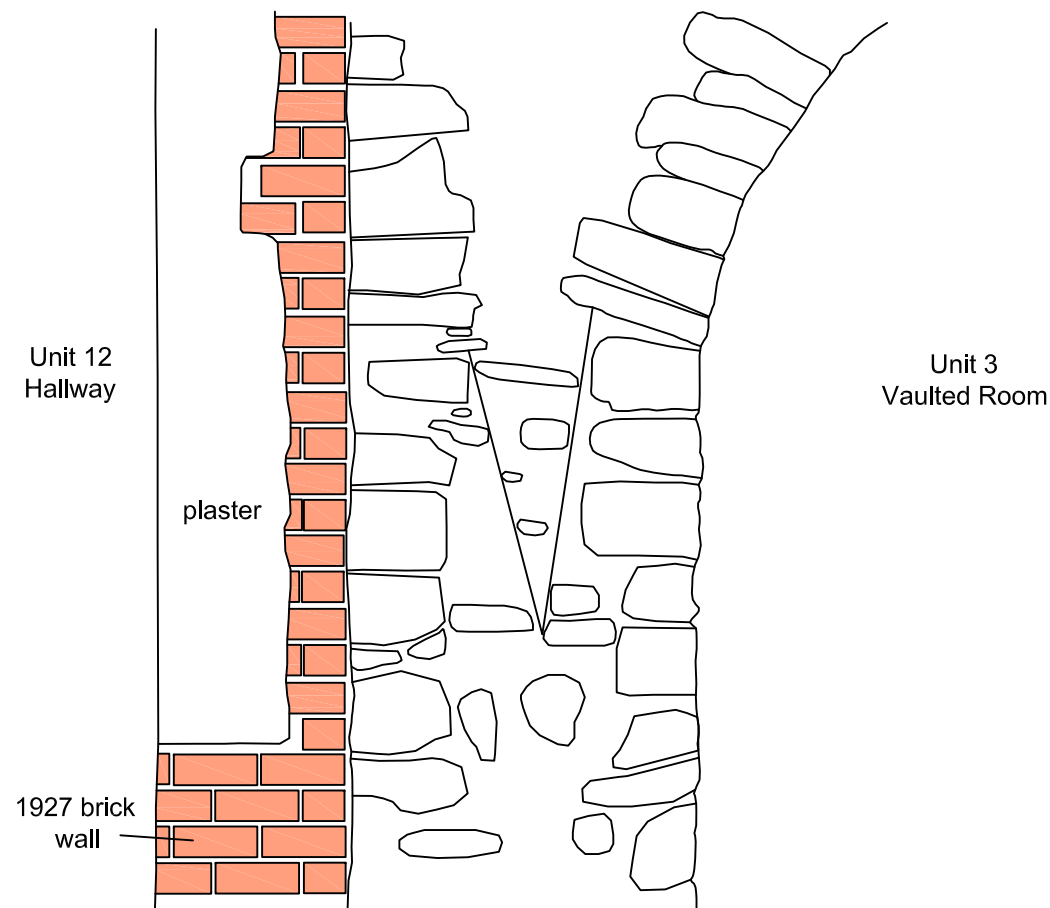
B West-facing elevation of new slapped doorway between units 12&3
